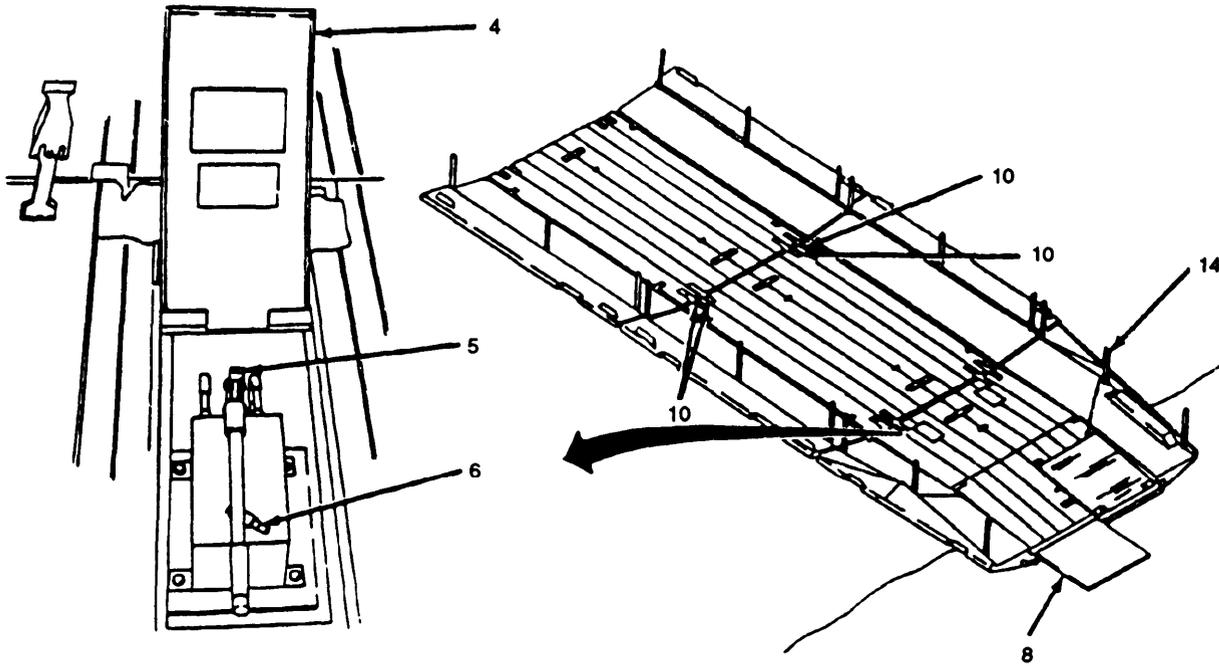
Bridge Assembly Successive Bay Method (Sheet 4 of 4).
